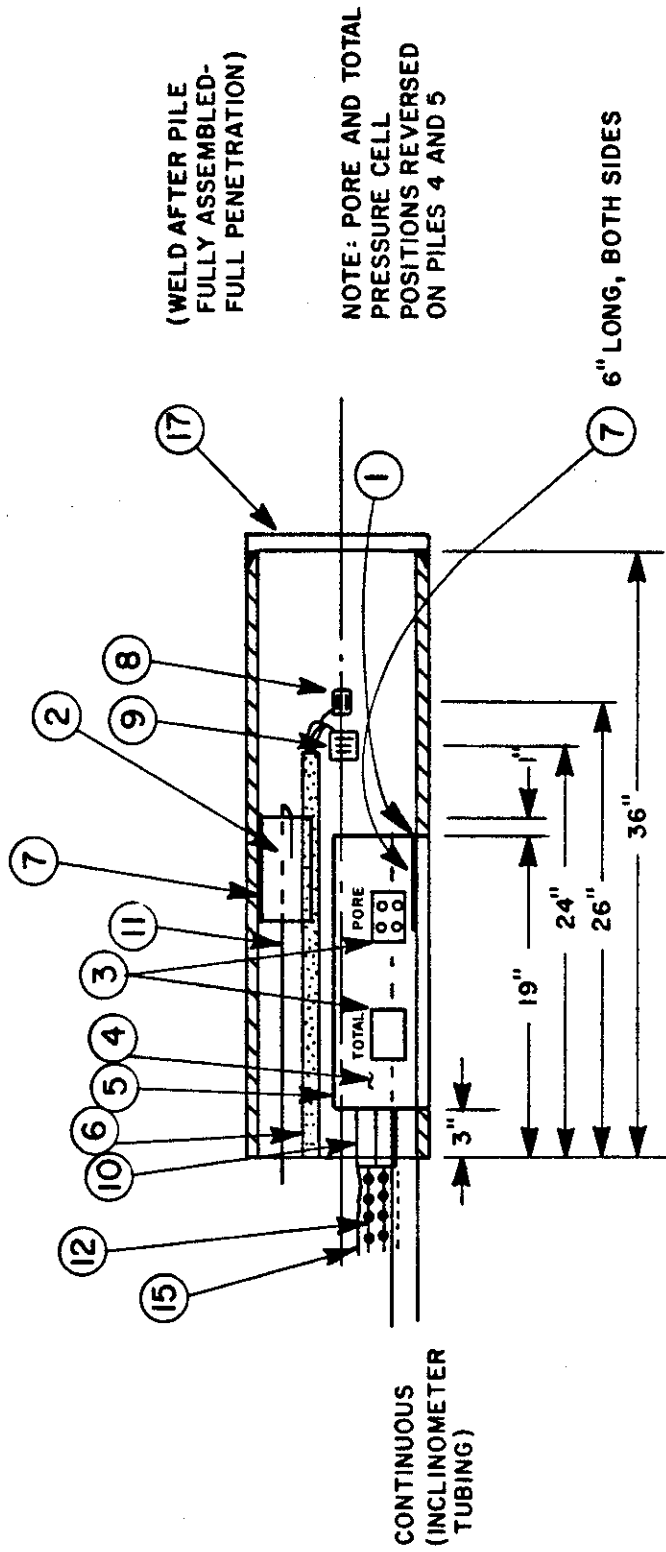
ELEVATION CUTAWAY OF END SEGMENT (1 in = 25.4 mm)
